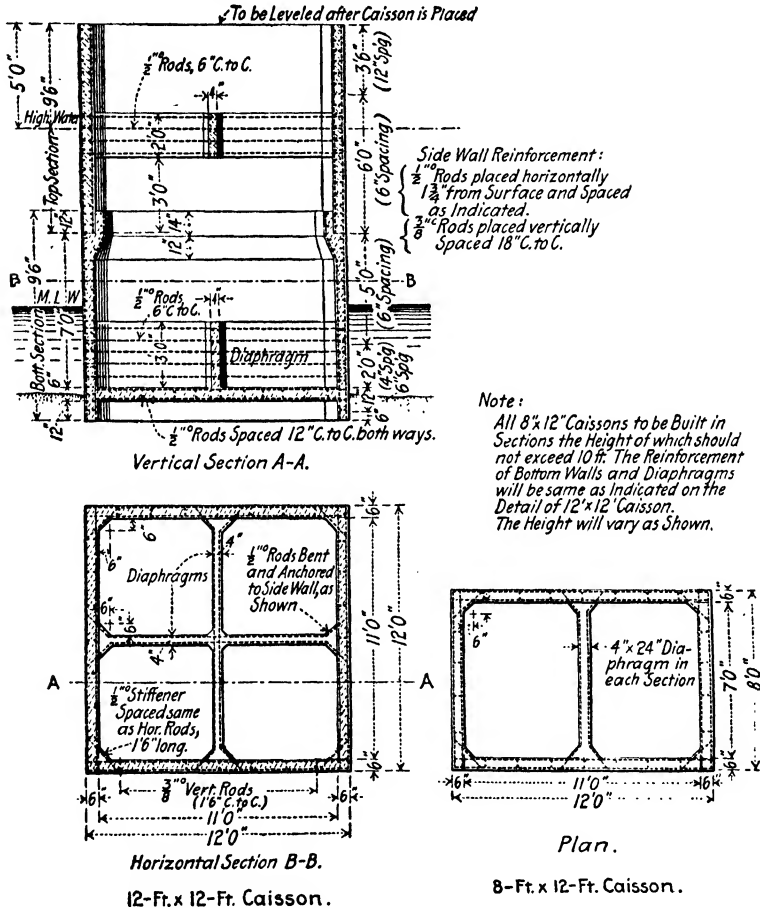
Box Caisson of Reinforced Concrete near Glen Cove, Long Island.
